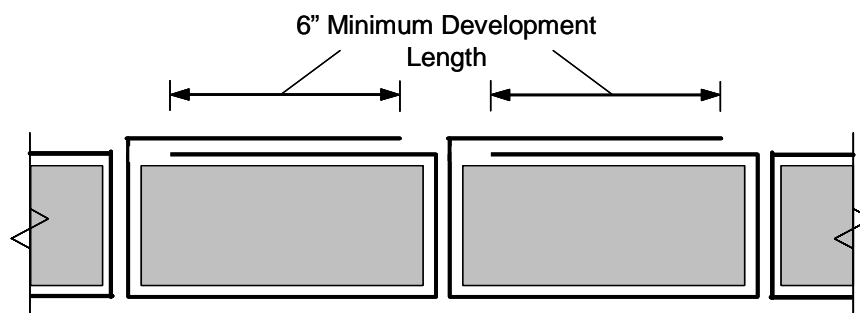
Connection Upgrade B4 CFRP Shear Stirrup Detail
